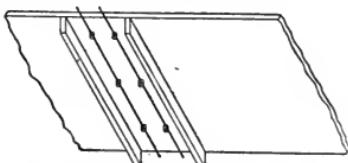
Conductors Protected by Wooden Guard Strips on Low Ceiling.
